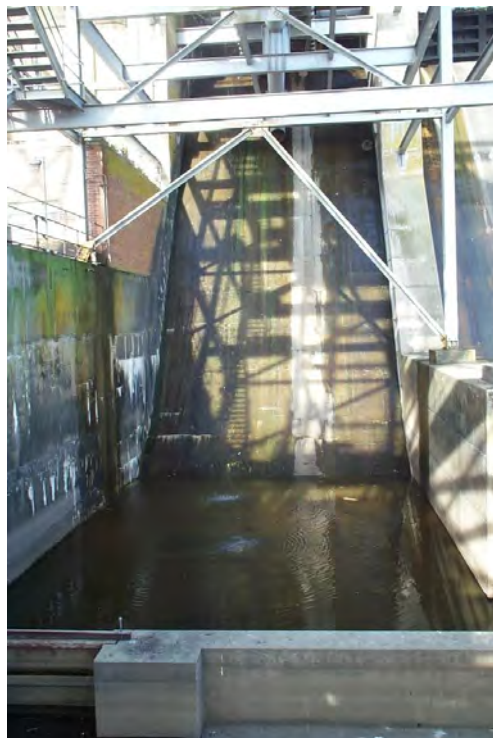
East Lift, looking upstream at spillway bay, attraction flow pipe at top.
